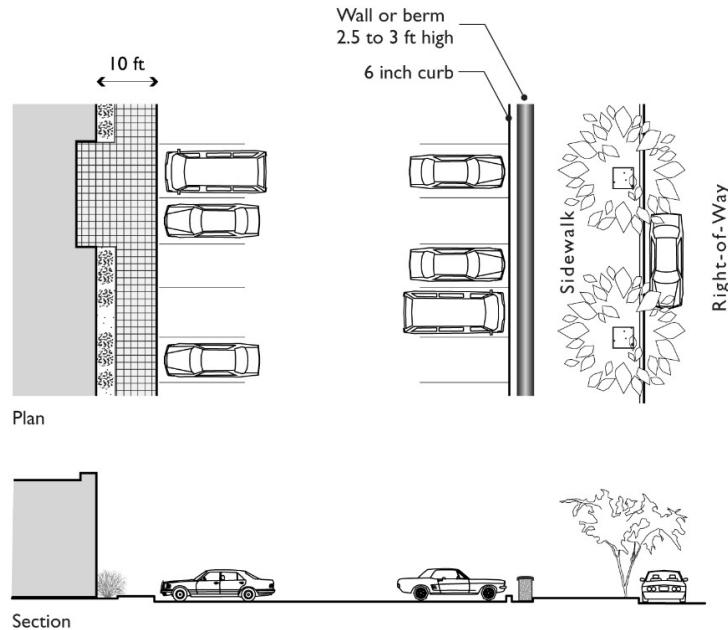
I(1): SCREENING AND SEPARATION OF PARKING AREA
